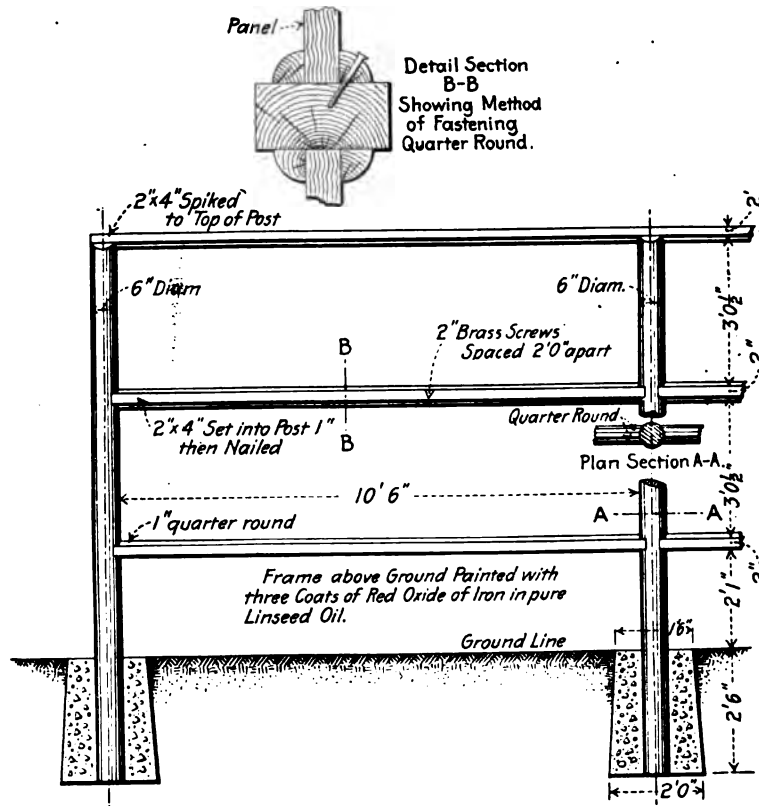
Showing Construction of Frame and Mounting of Test Pieces.
